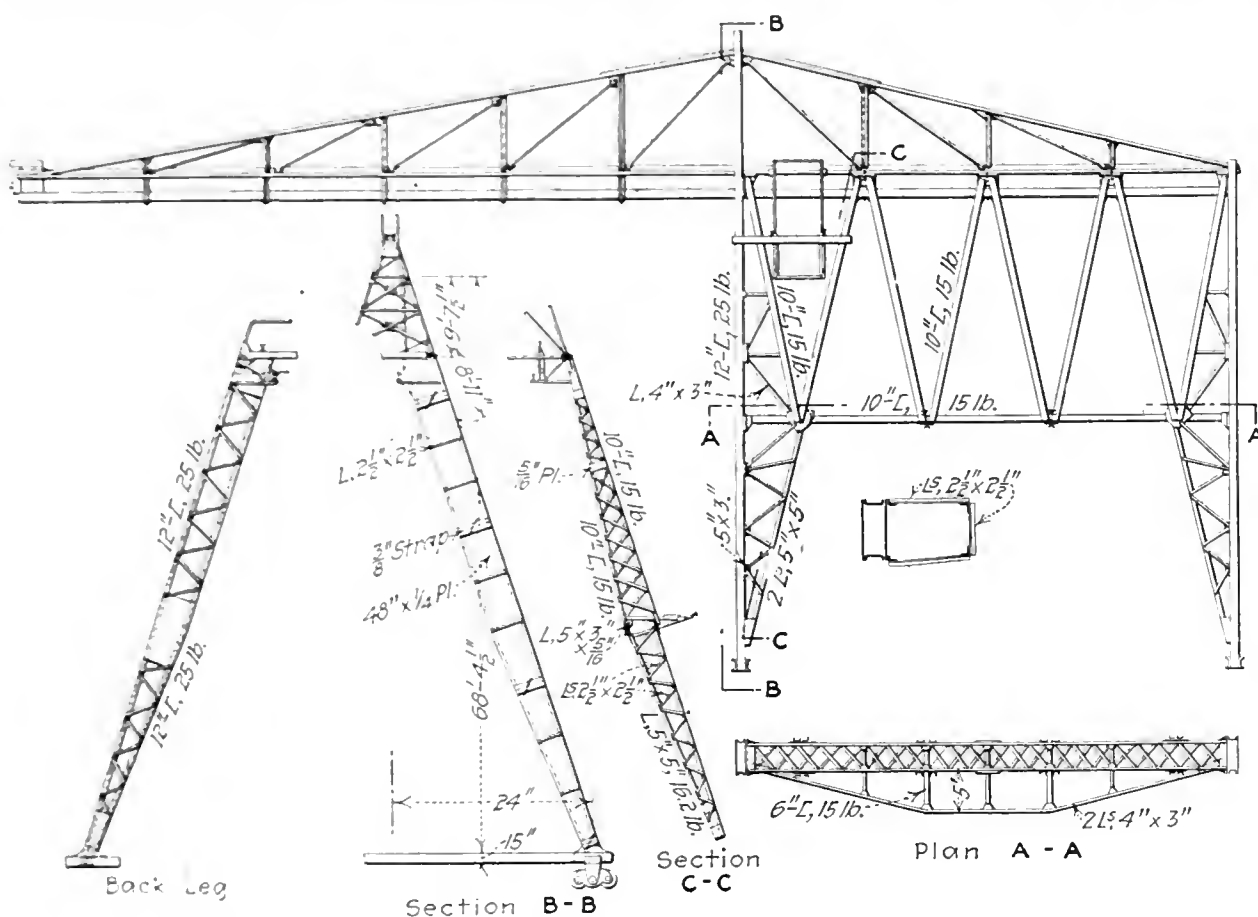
OUTLINE DRAWING OF ECORSE CANTILEVER CRANE
